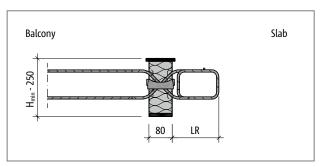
Schöck Isokorb® type Q-E-W-VV: Product section, representation of bond length LR
